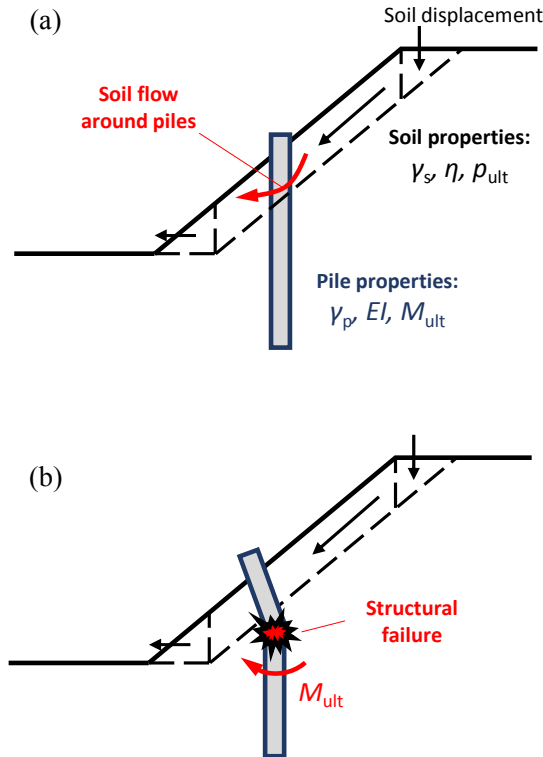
Failure mechanisms of a pile-reinforced slope: (a) soil fails first; (b) pile fails first.
